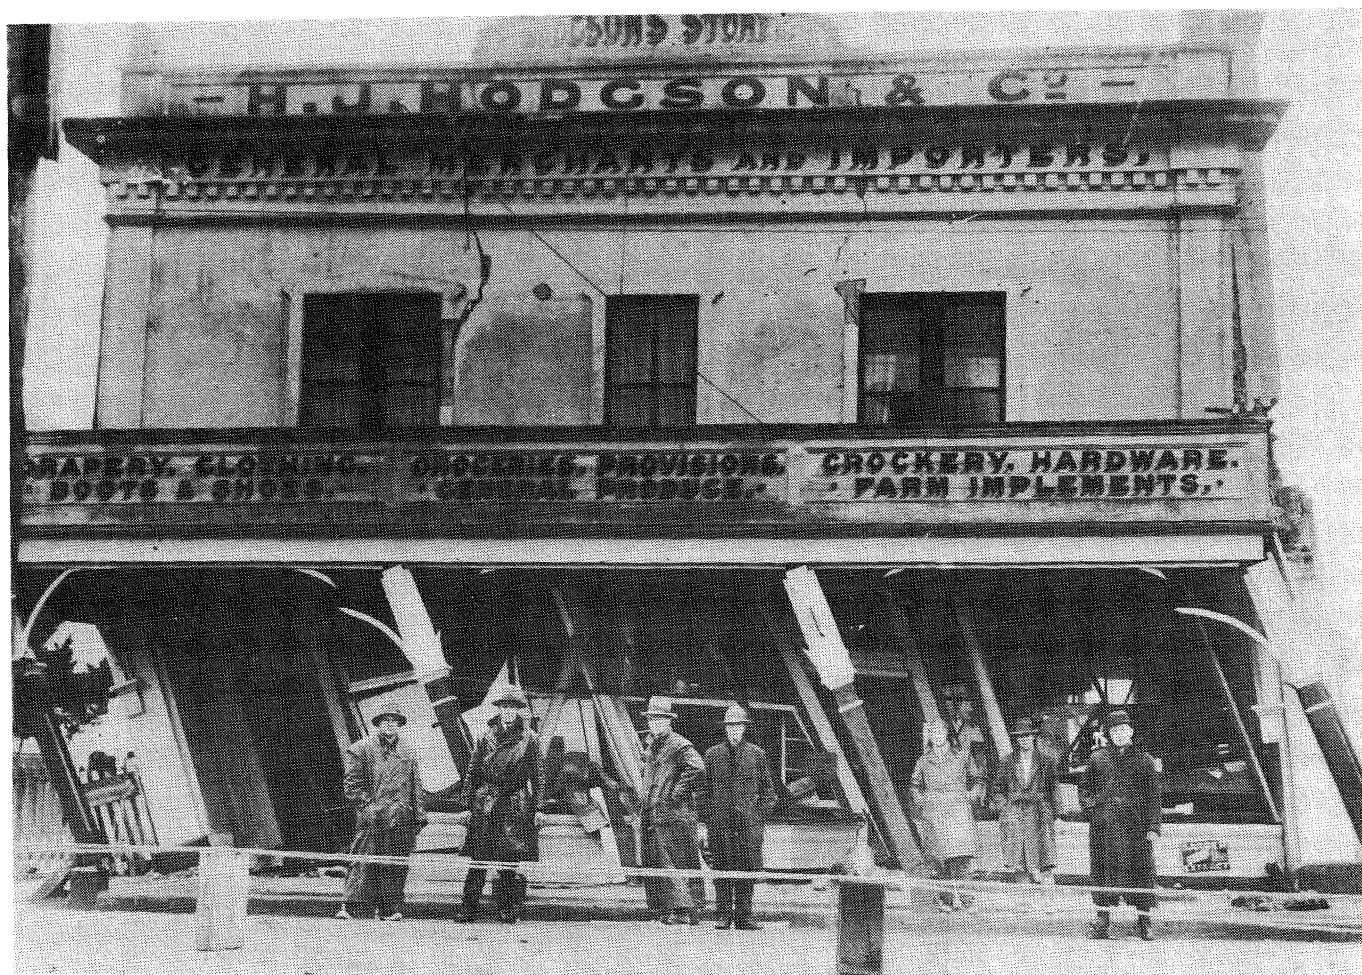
Hodgson's store, Murchison, reinforced concrete, showing soft storey effect due to absence of lateral load resisting frame in shop's frontage. (Reproduced by courtesy of the Alexander Turnbull Library, Wellington, New Zealand).
